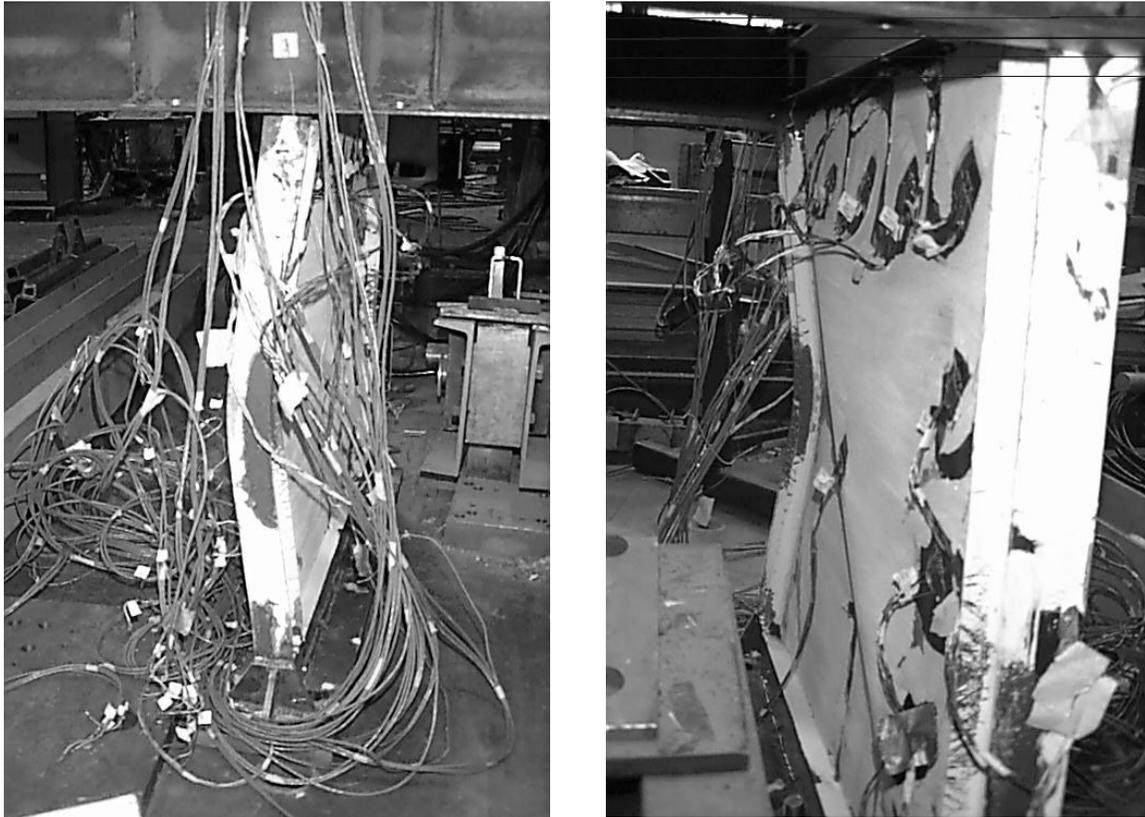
State of damage to the first storey panel and columns of the quasi-static 4-storey shear wall frame at the termination of test
